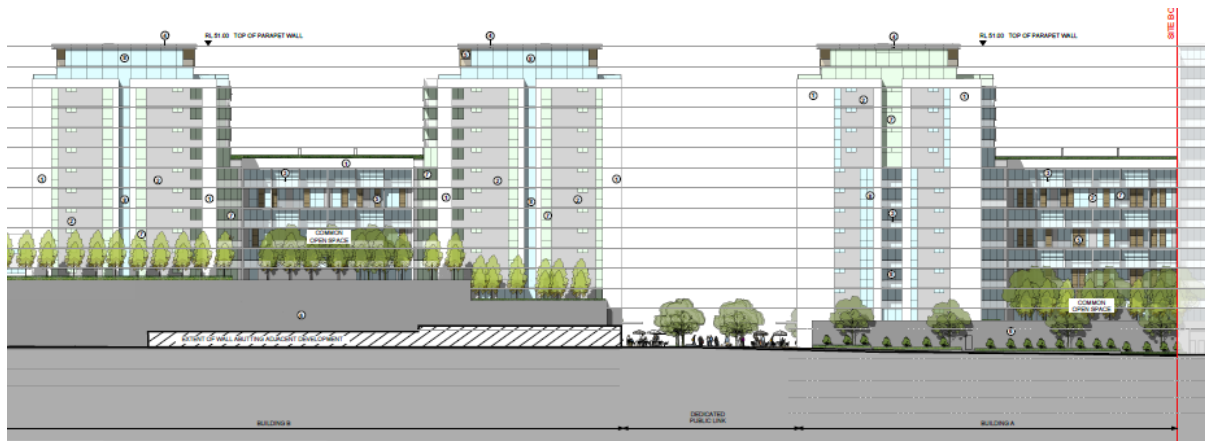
Approved Northern Elevation (Building B on left as viewed from Jackson Drive)
